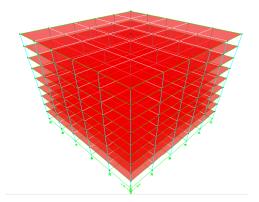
Model 4: 3D Model of flat plate of G+8 storey building
